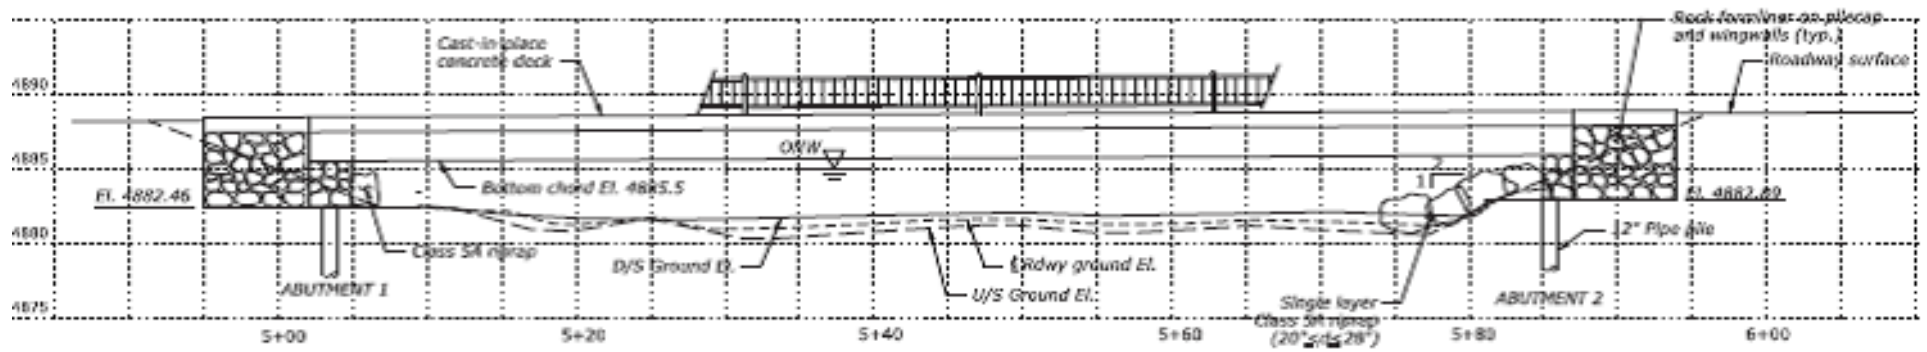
Preliminary design layout for the new Swiftcurrent Bridge; typical bridge section depicting elevations.
